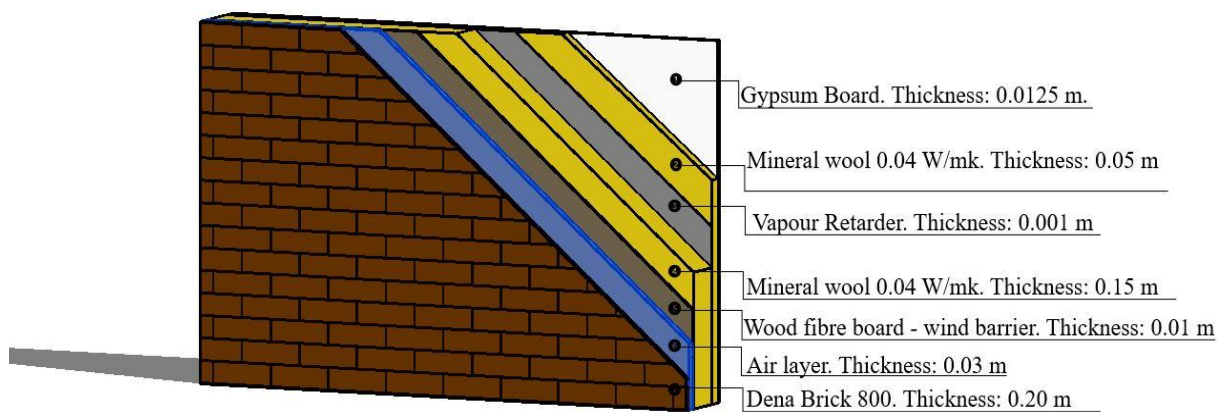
North exterior wall. Byggforsk 542,301 Brick glazing
